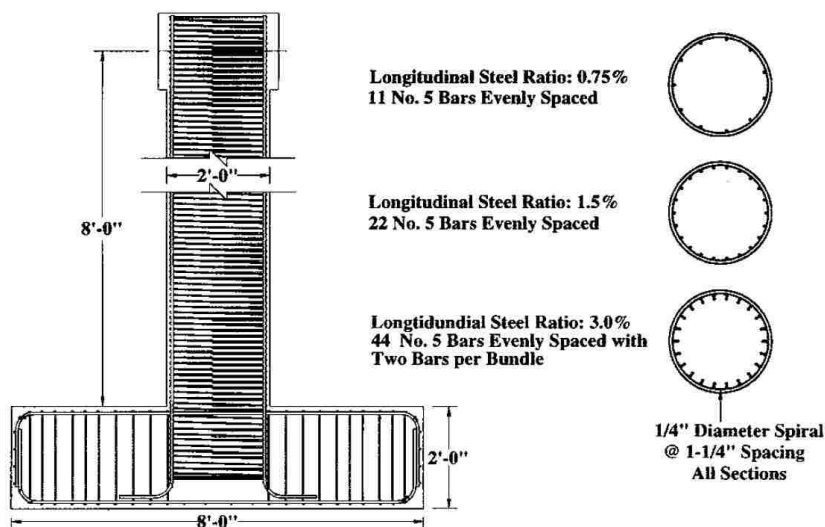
Original Column Geometry (Lehman, et al., 2001)
